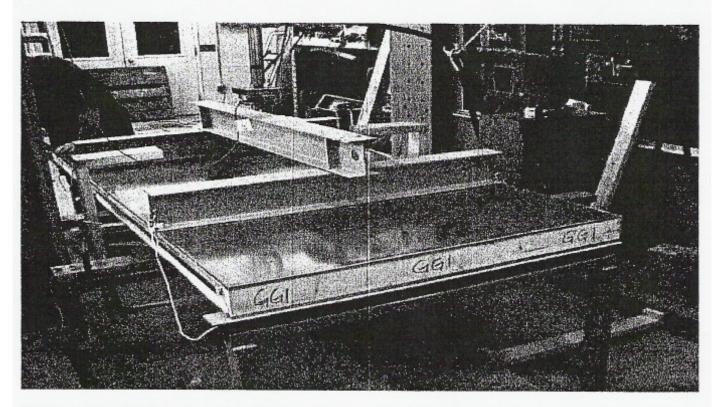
Test Setup for Transverse Loading 8' Galv.-Galv. Panel
